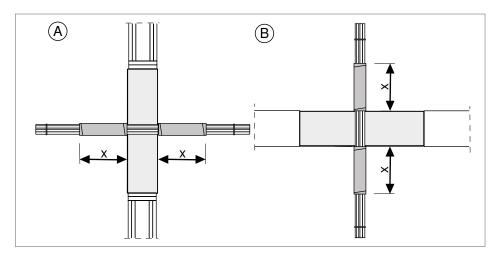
Measure: FSB-WB 1.5 fire protection coil in wall A and ceiling B
